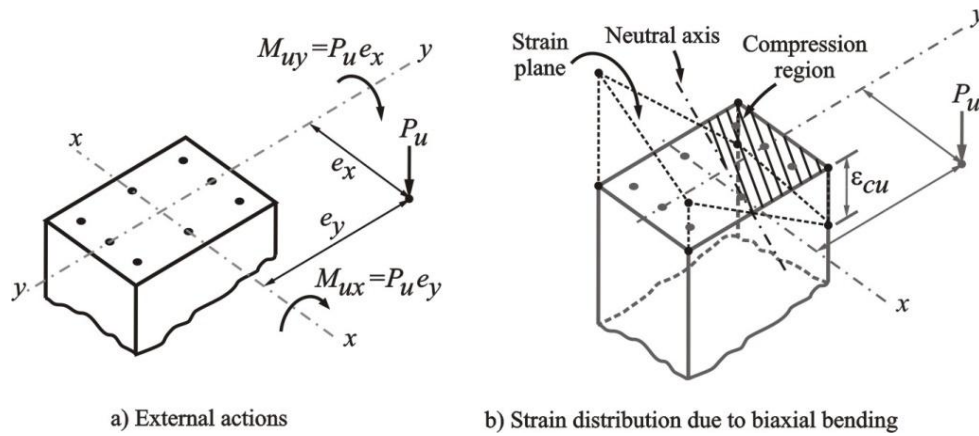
Reinforced concrete column member subjected to axial force and biaxial bending
